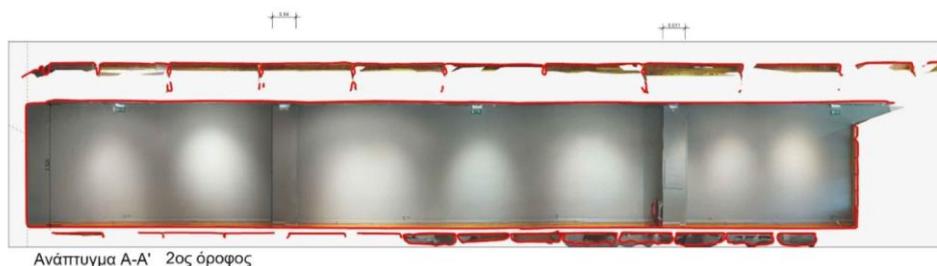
Development of second floor of the Art Gallery (section A-A')
